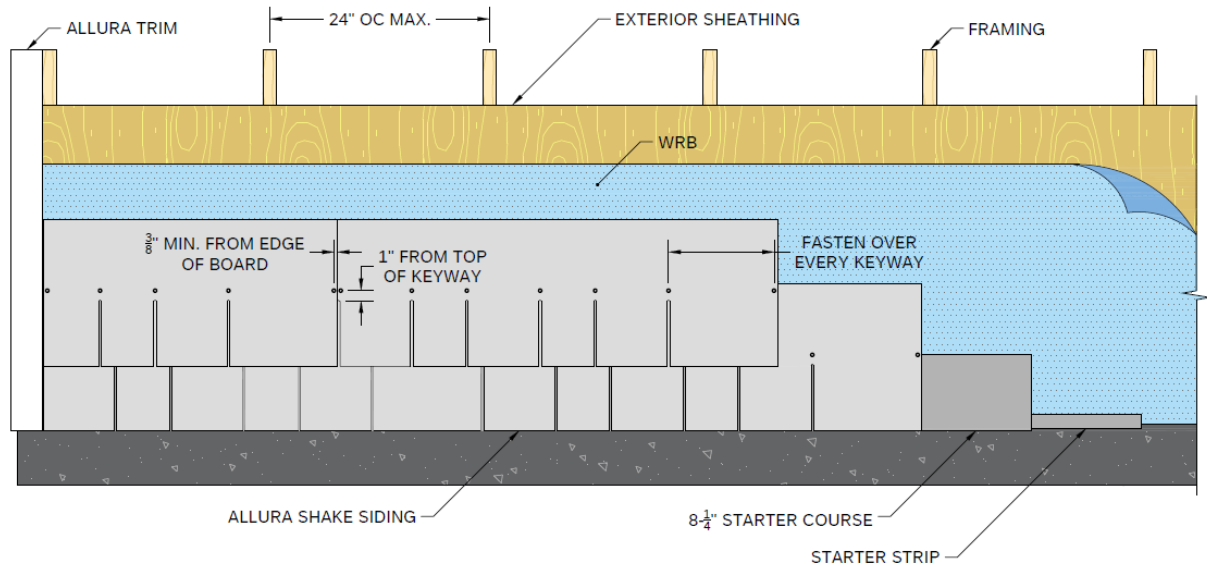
Allura® and TerraPlank™ Shake Siding Blind Nail Fastening Details
